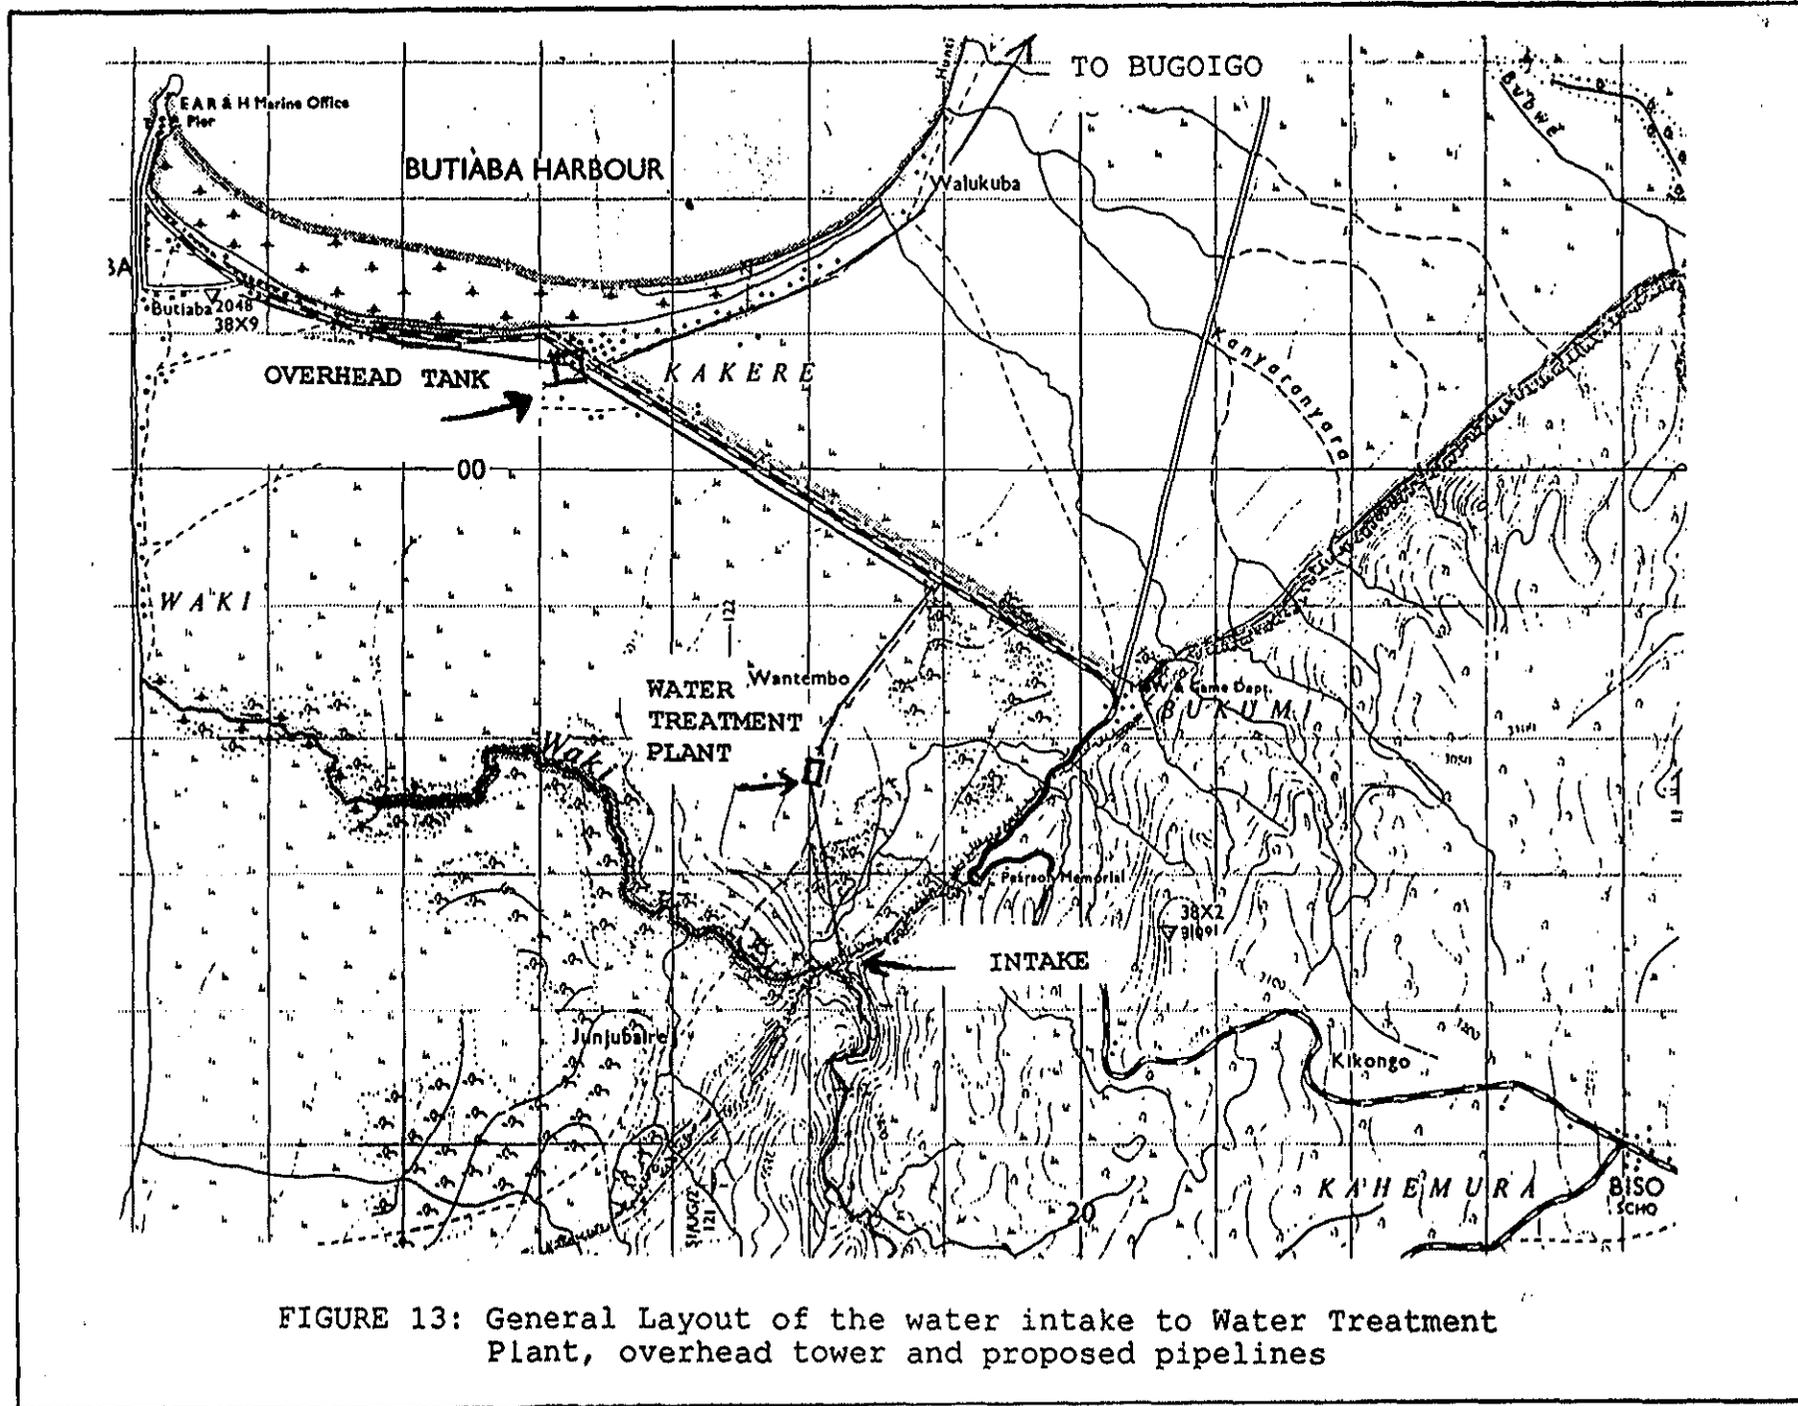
General Layout of the water intake to Water Treatment Plant, overhead tower and proposed pipelines
